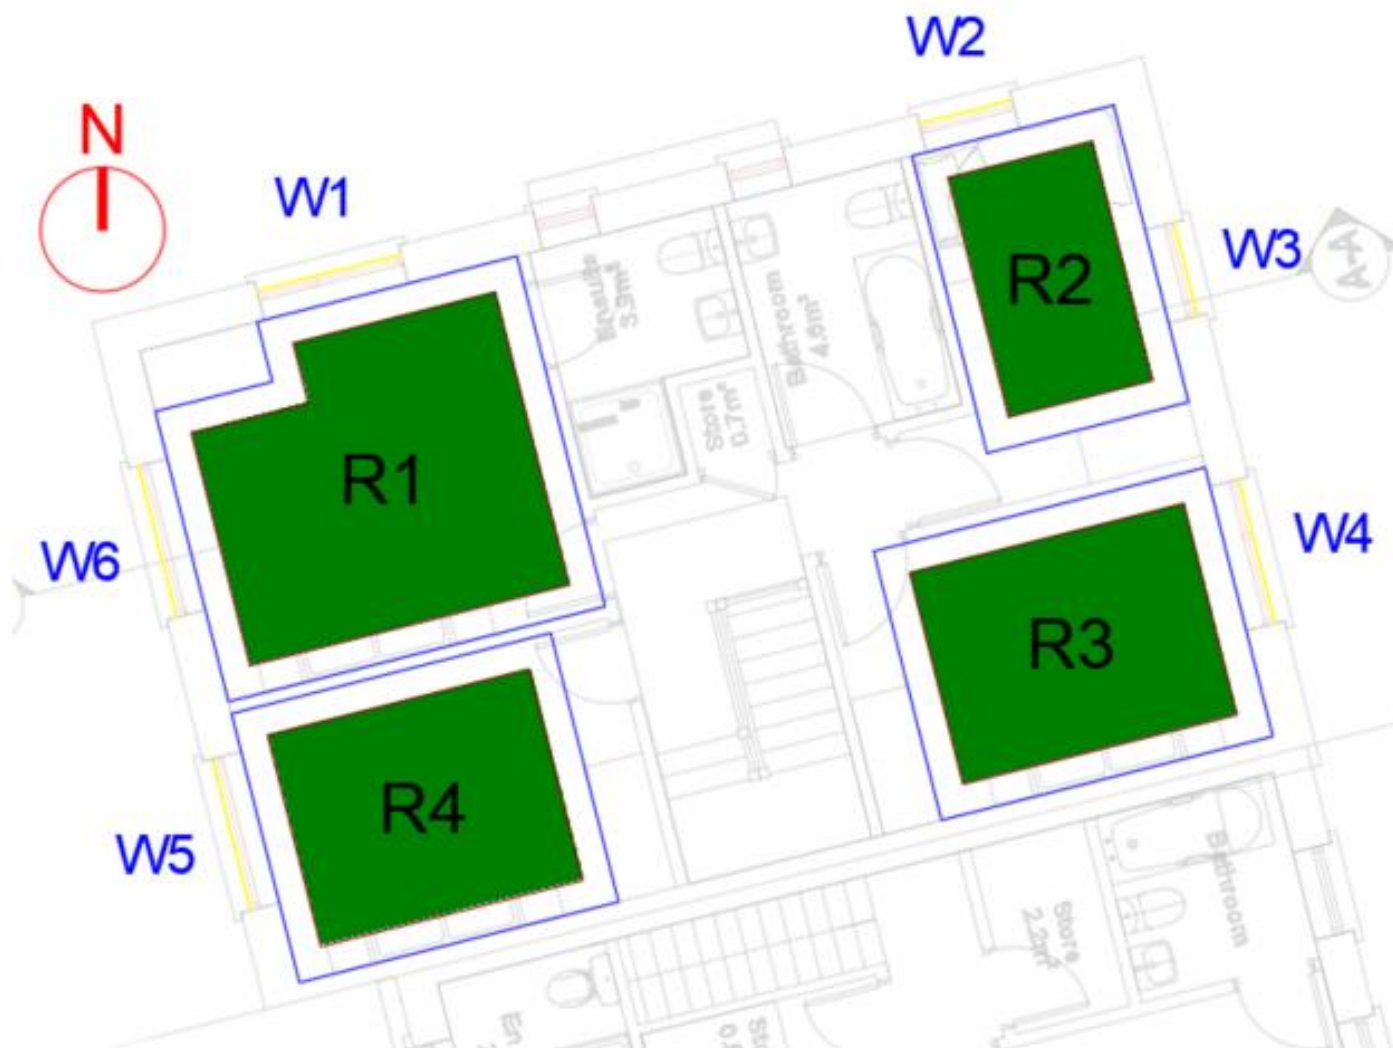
Proposed First Floor sDA Contours of House B-02 2-008
